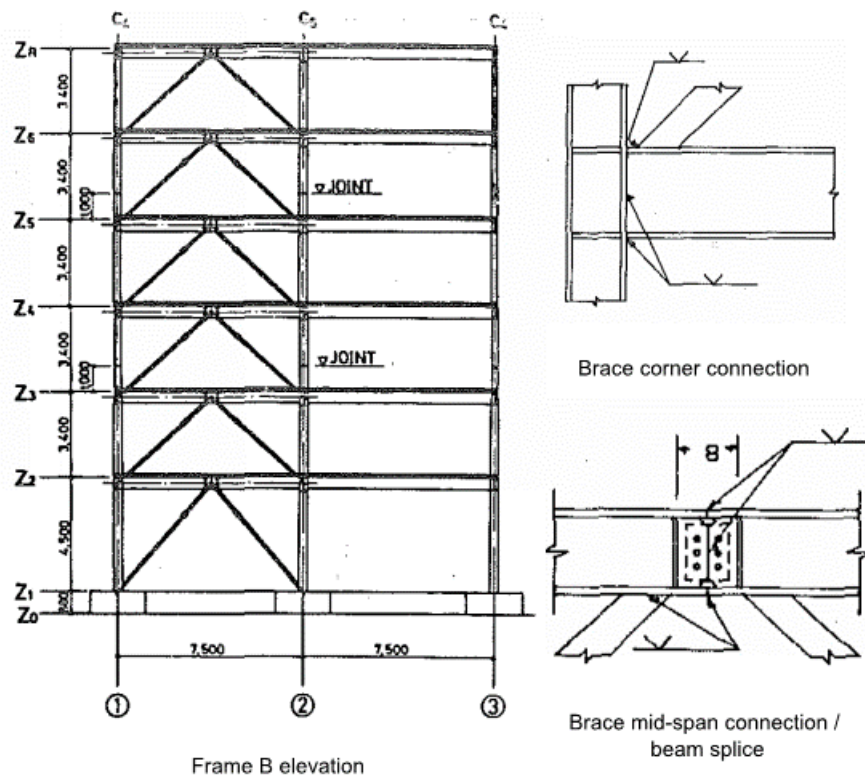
Elevation and connection details in six-story US/Japan specimen (Foutch et al. 1987)
